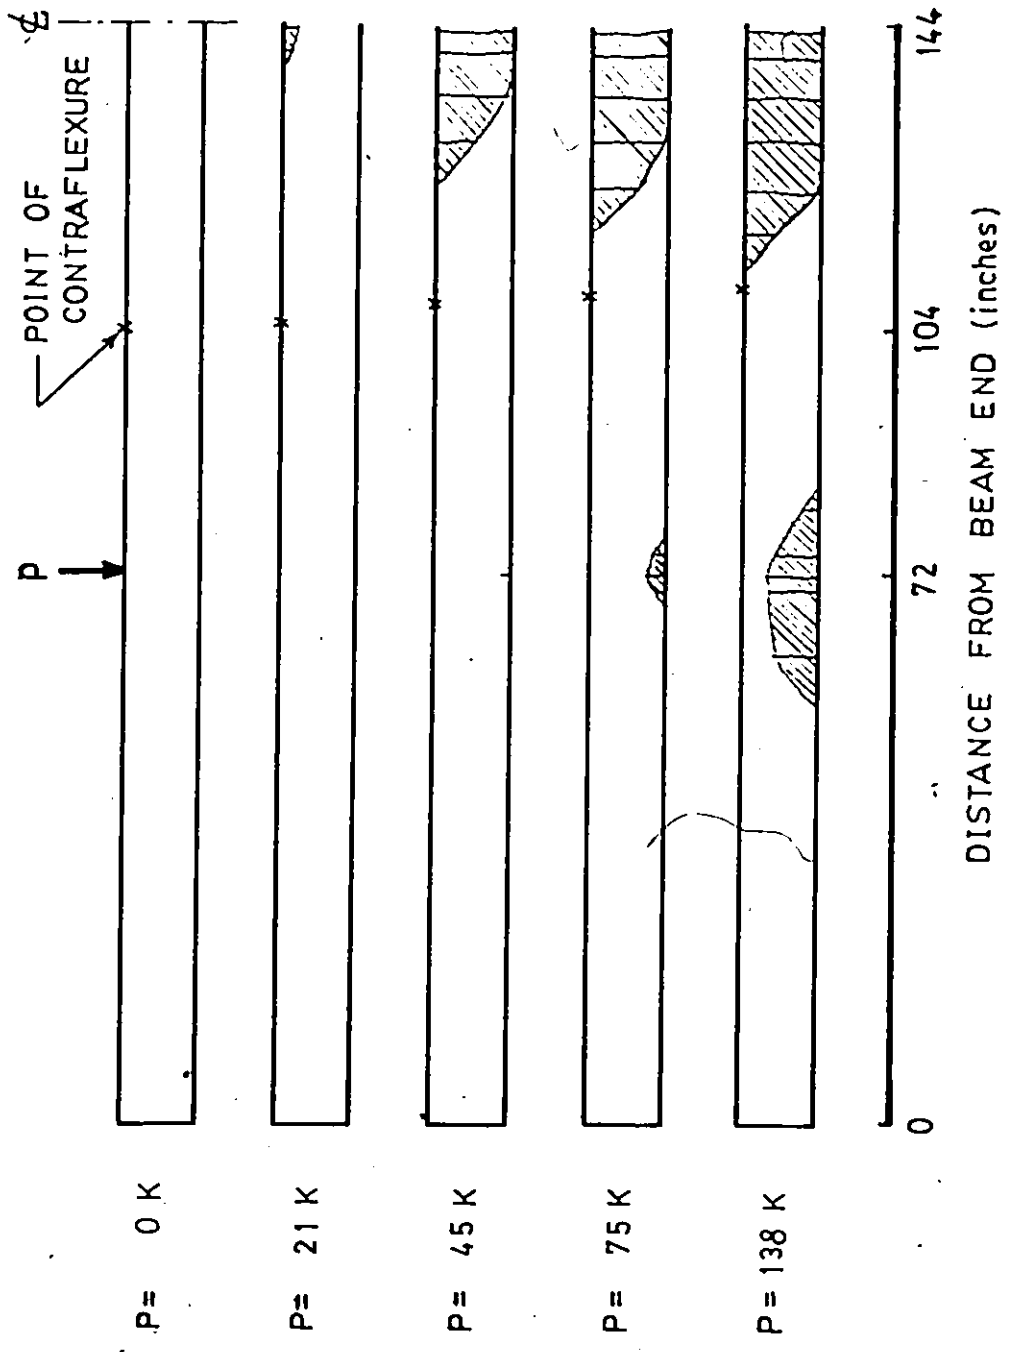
APPROX. CRACK PROPAGATION IN CONCRETE SLAB FOR BEAM CB2
